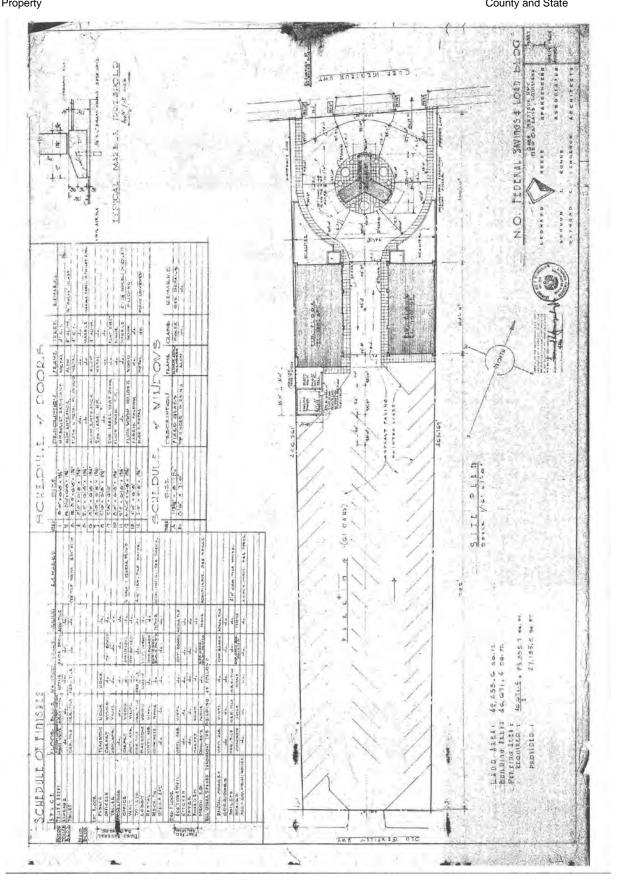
Original Plans – Site Plan. Image courtesy of Reggie D. Winfield
